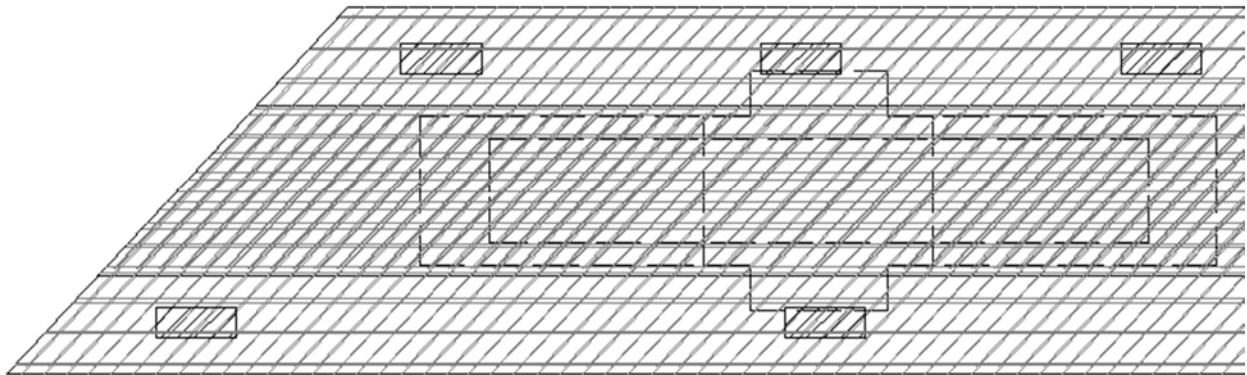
Skewed Transverse Reinforcement in skewed ITBCs
